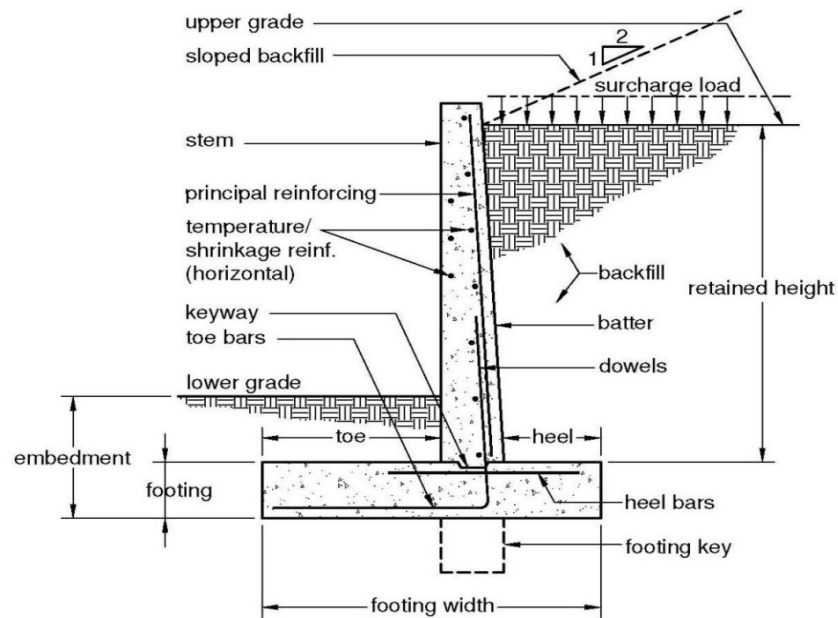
Visualization of terminology related to retaining wall (Hugh Brooks, Basics of retaining wall design, 10th edition)
